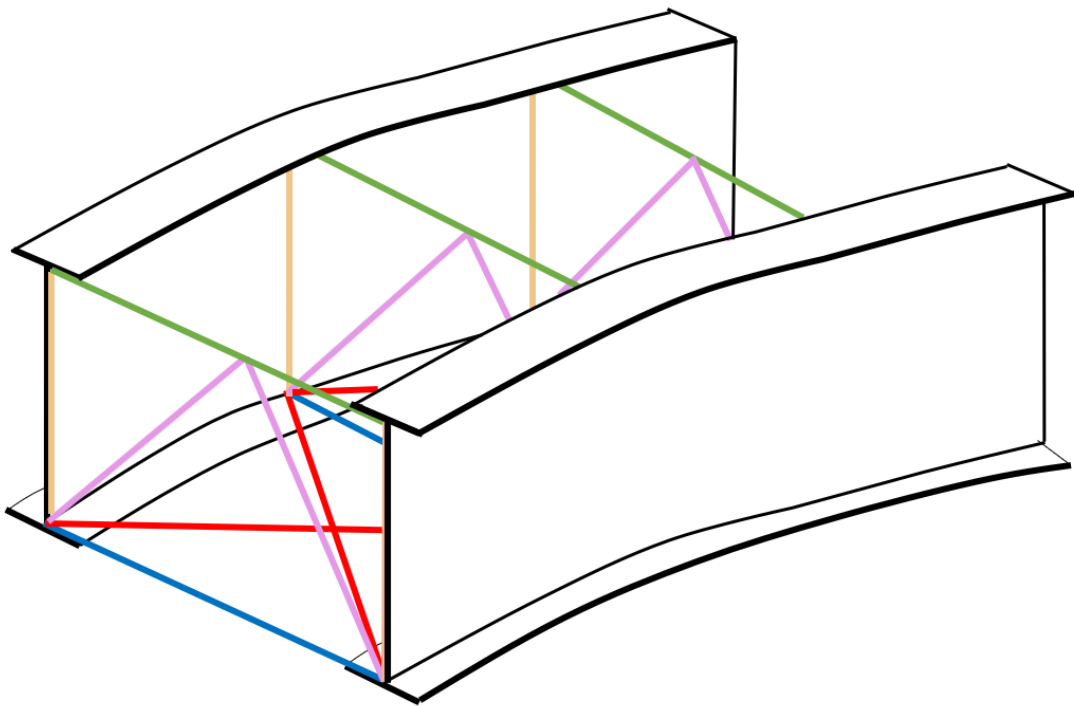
Positions of the parts that constitutes the cross-bracing and the plan bracing.
